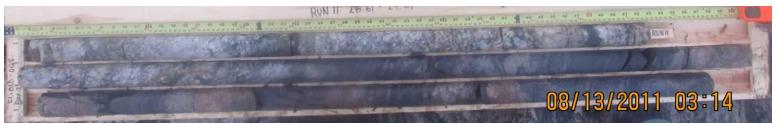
Core Box #7 of 9 (Runs 10-11, 25.3m – 29.3m)
